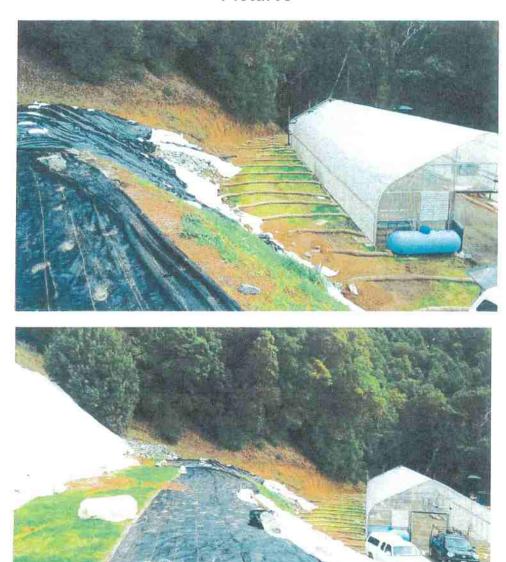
This is a picture of the newly rock lined drainage ditch (Map Point 2.5) that drains a "French drain" outlet that collects from the surface of the developed cultivation area. It ends above a swale that contains the top of a Class III watercourse and a Class II spring and POD. Photo date 12/2/2016
